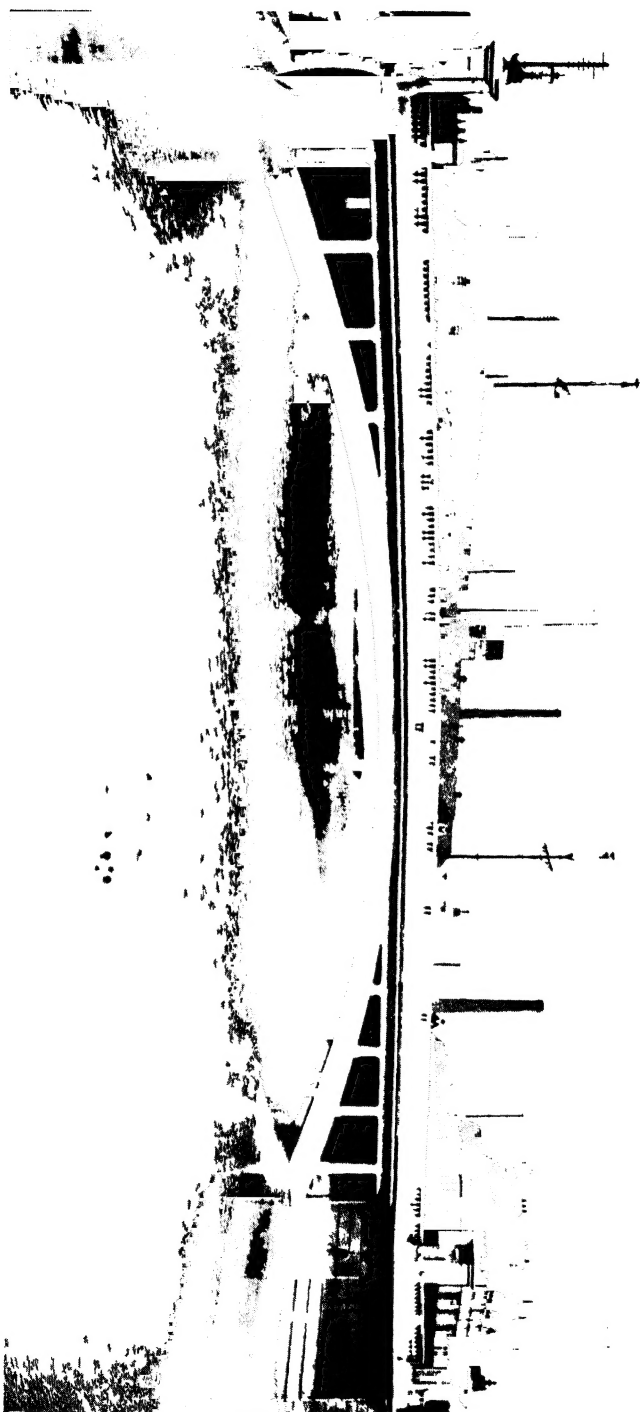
WELLINGTON BRIDGE. 134 FT SPAN
